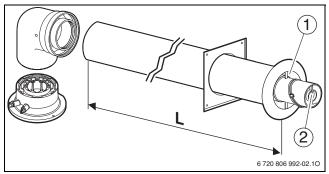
Horizontal venting system (telescopic concentric vent kit)
